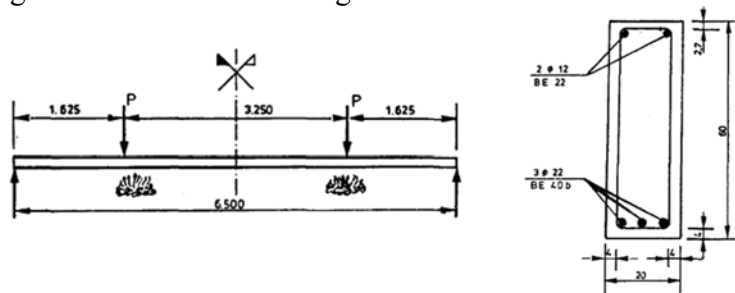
Loading and heating system of the reinforced concrete beam (Dotrepe and Franssen, 1985)
